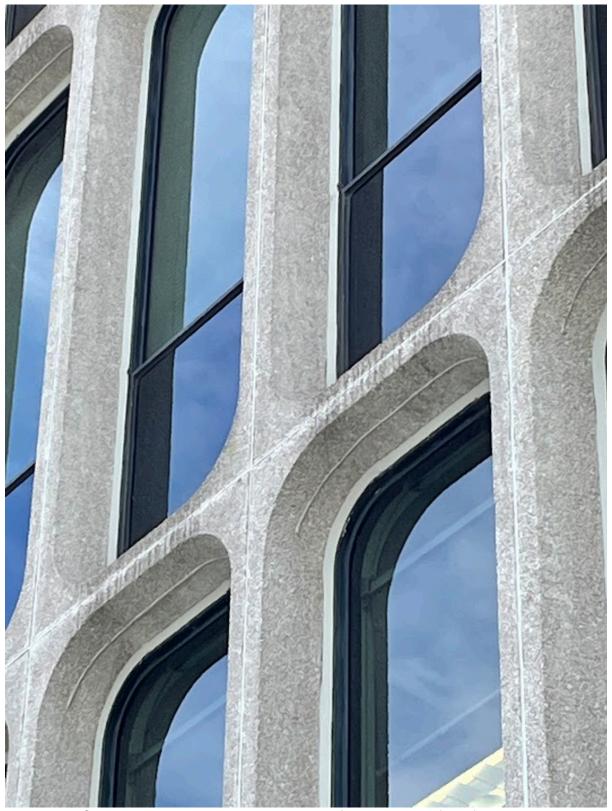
Current photograph showing detail of the deep profile of the precast concrete panels (Heritage Planning, 2022)
